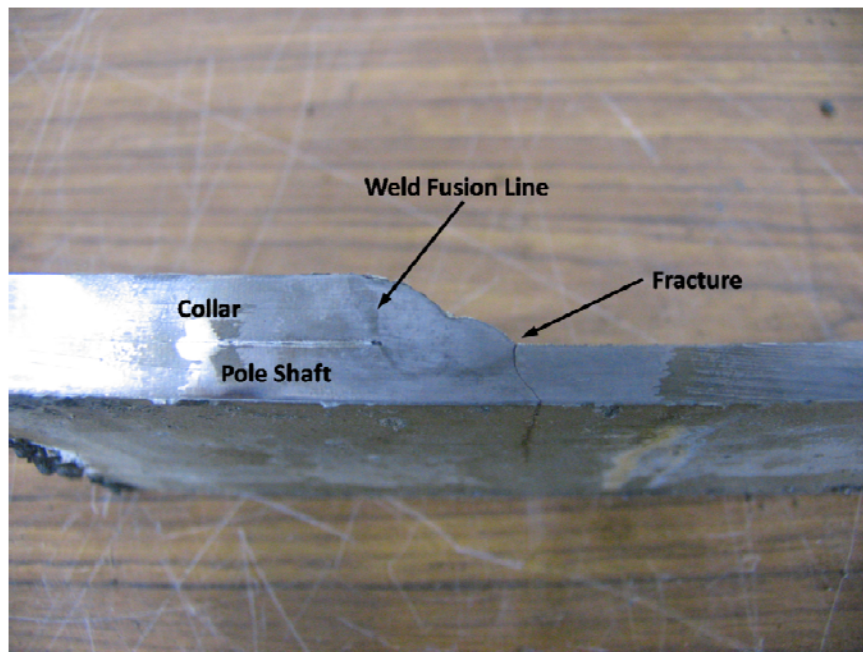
Section of Collar Weld in Wyoming External Collar Connection
